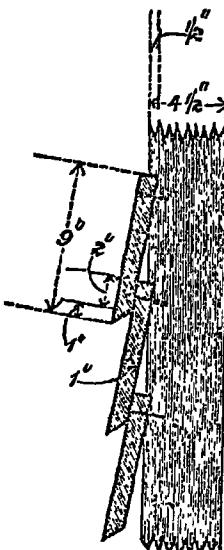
shows in section a method of forming a wooden wall with horizontal overlapping planks. The lower edges of the planks are bevelled so as to prevent water rising by capillarity and entering the room. The uprights to which the planks are nailed are slightly notched, so as to give the planks a flat surface to rest on. Scale = $\frac{1}{12}$.
